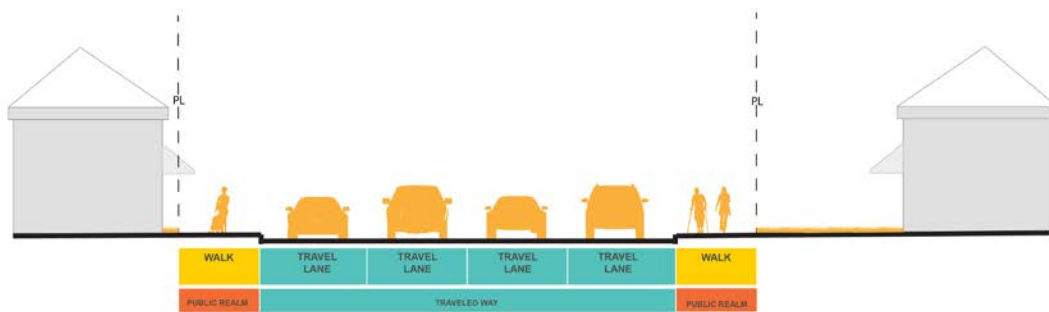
Illustration of the existing typical cross section of 50 Avenue and 53 Avenue east of Main Street.
